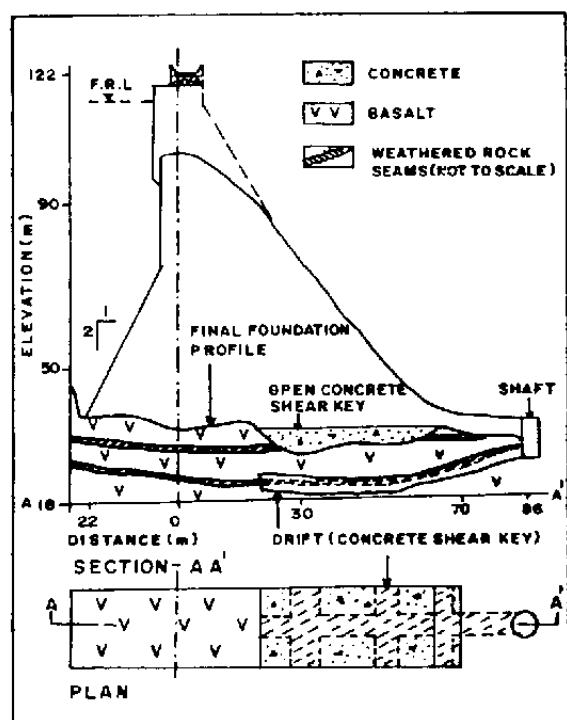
Typical section and plan of spillway block showing foundation treatment of weathered rock seams.
